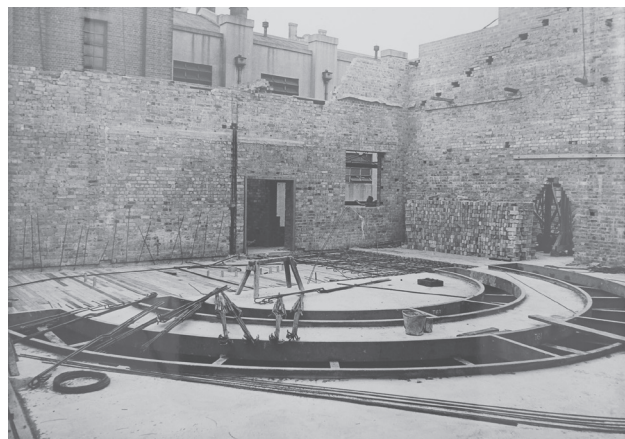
Construction of the new Control Room, 1949 (courtesy of the Railways Department, E1379).
